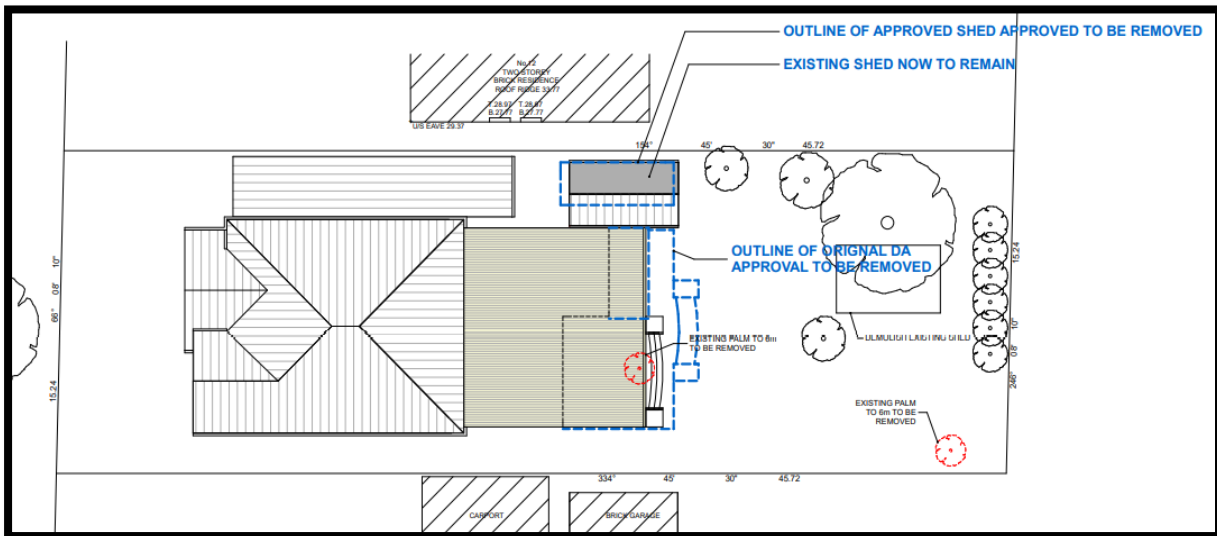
(DA 2018.124.2) - Previous approved Ground Floor Plan
